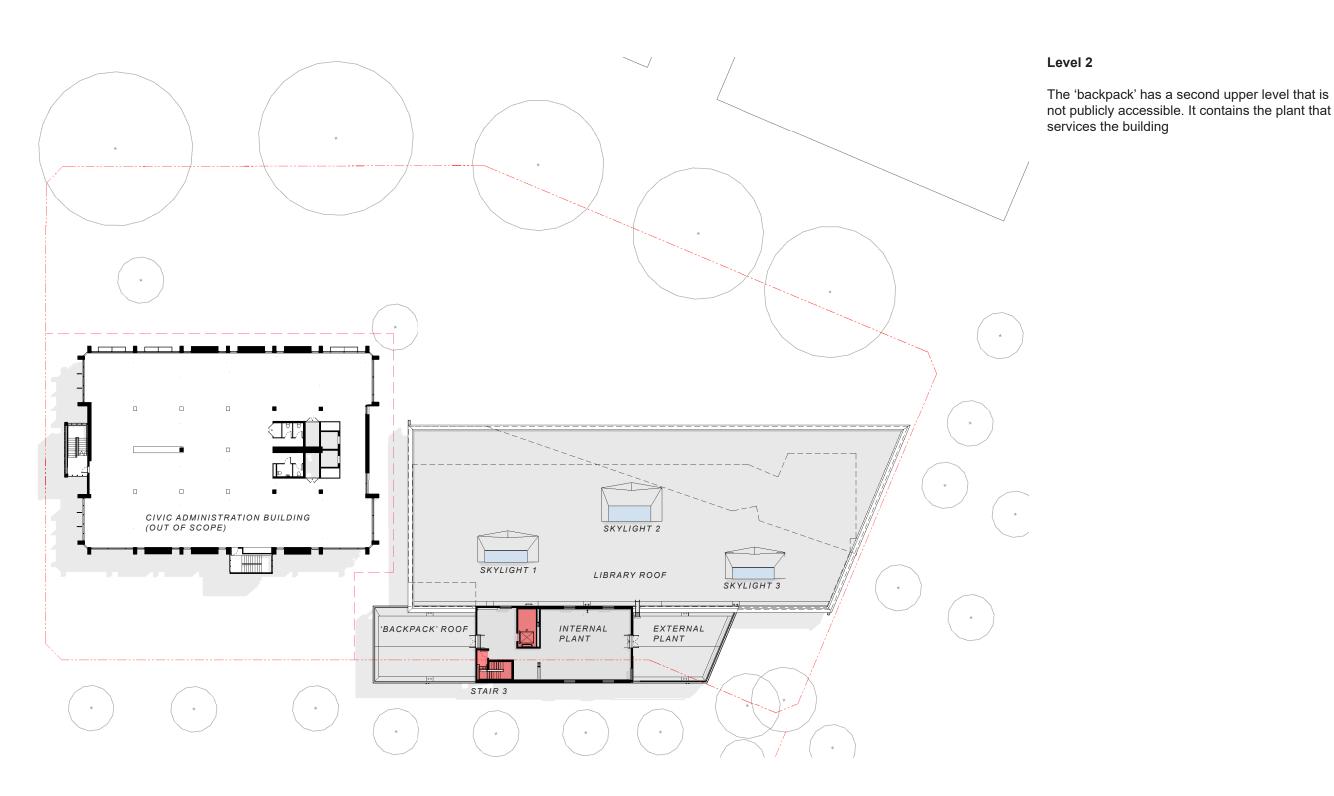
Level 2 Plan - This plan indicates the internal plant and external plant areas as well as the three skylights providing natural light to deeper parts of the level 1 collection space. Note the CAB (existing Library Tower) is out of scope. Indicative future design shown.
